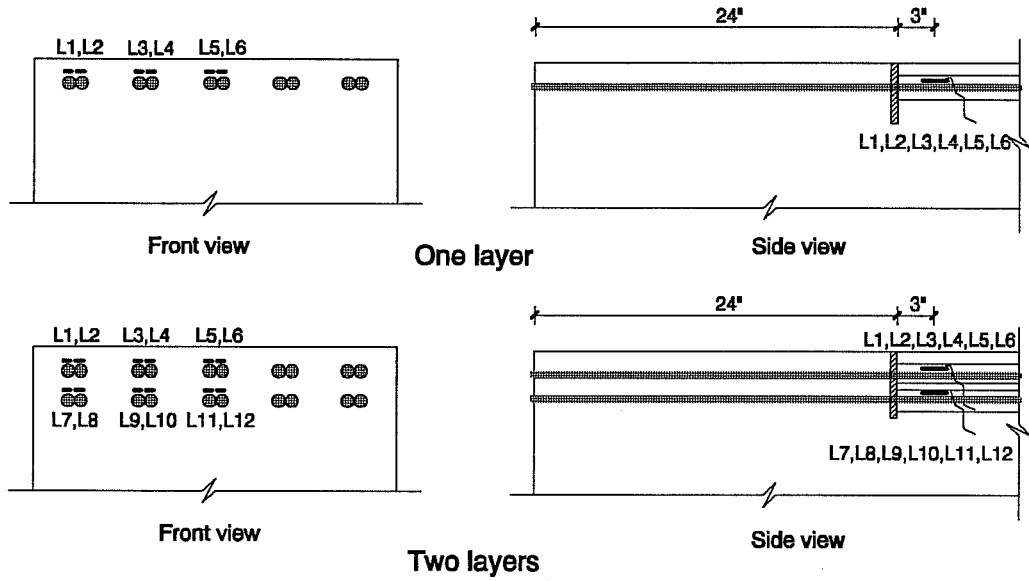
Position of strain gages for test without transverse reinforcement (specimen #2, #3)
